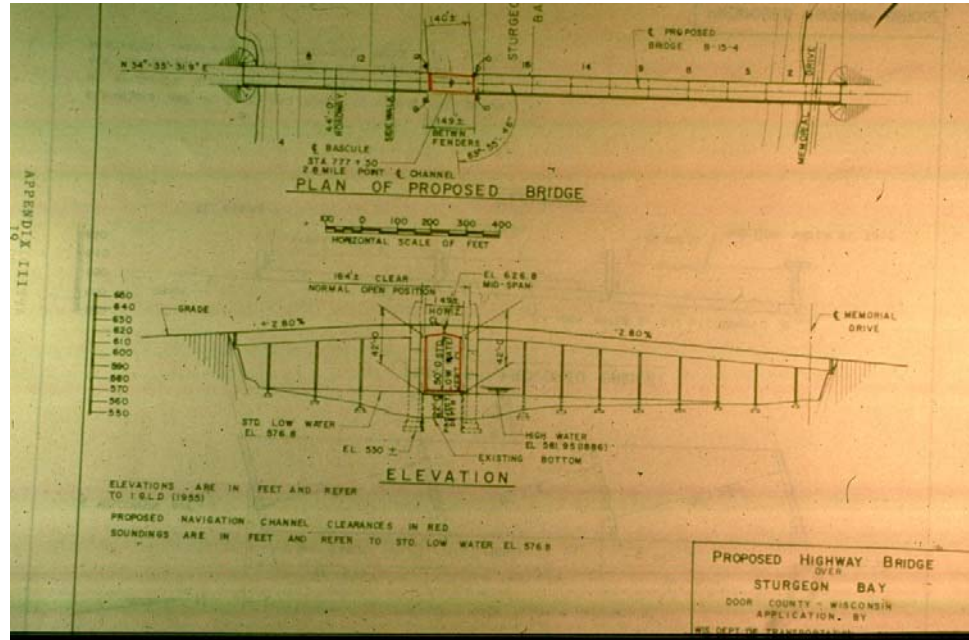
Typical "Permit Drawing" Showing Channel Width and Underclearance, Both Closed and Open, that Must be Provided
